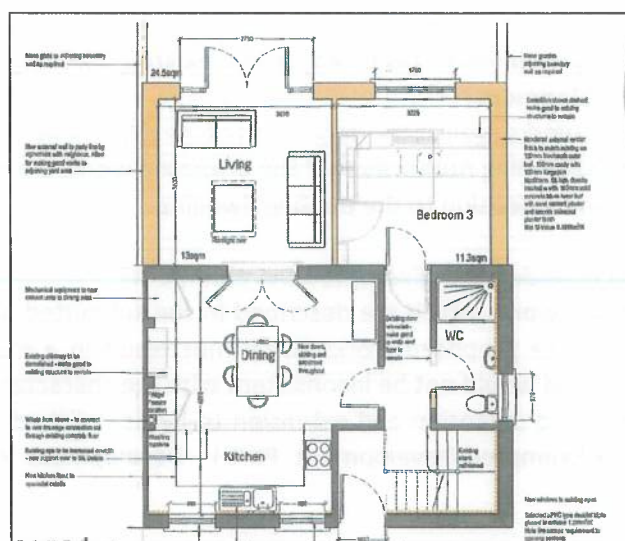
Proposed single storey extension to the rear of existing dwelling (as submitted).
